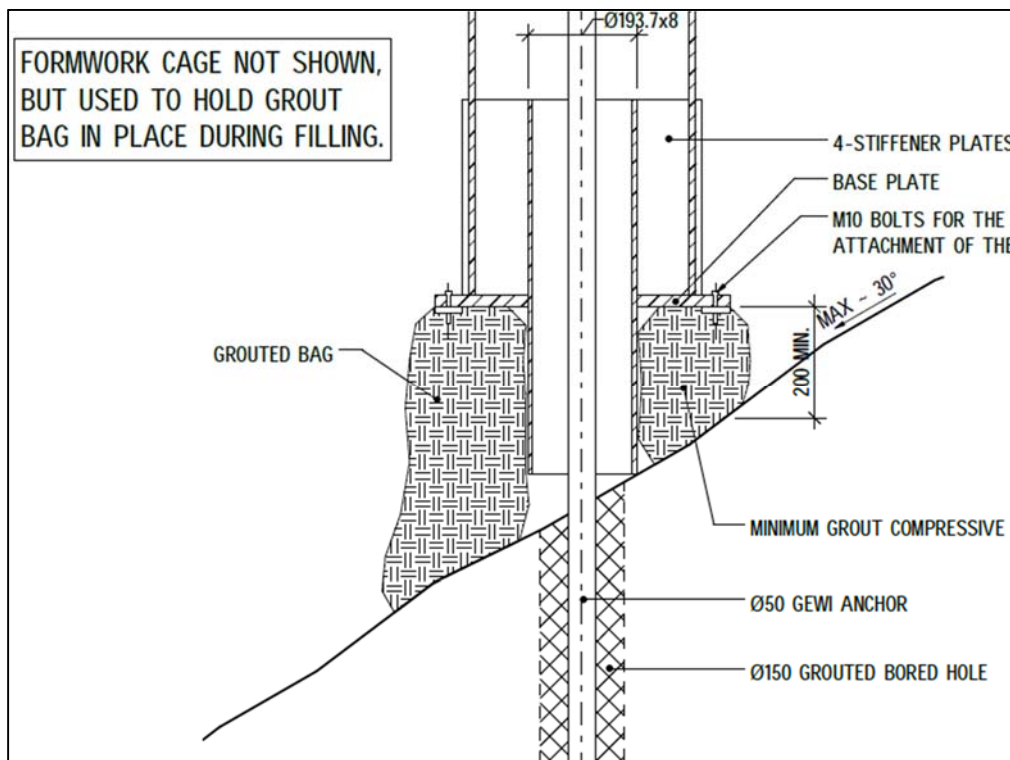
Indicative Position of Grout Bag on Rock Bed
